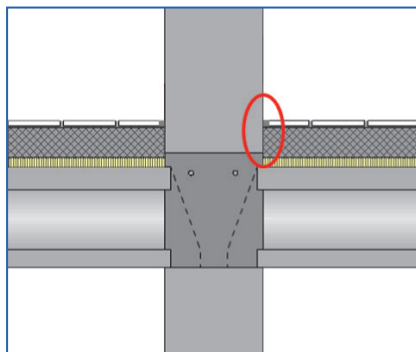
Heavy floating floors with unintended connection to the wall is a typical workmanship error.
